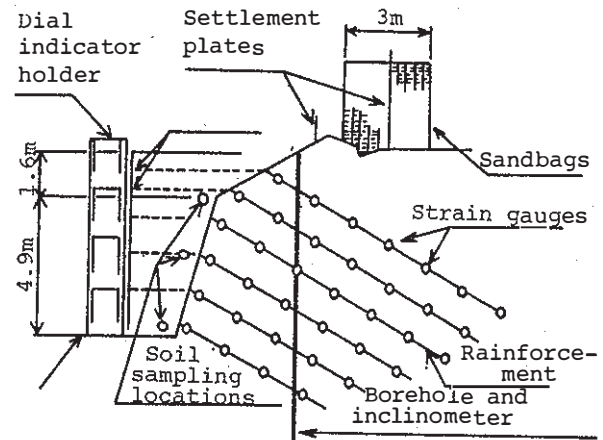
Plan of the reinforced slope (after T. Matsui et al.)
